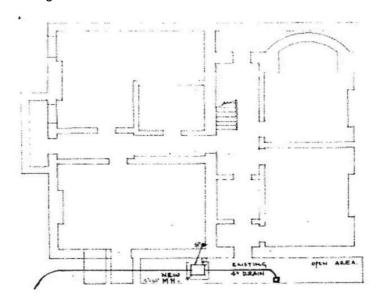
1945 Basement Drainage Plan (Camden Archives) showing historic opening to passage.
